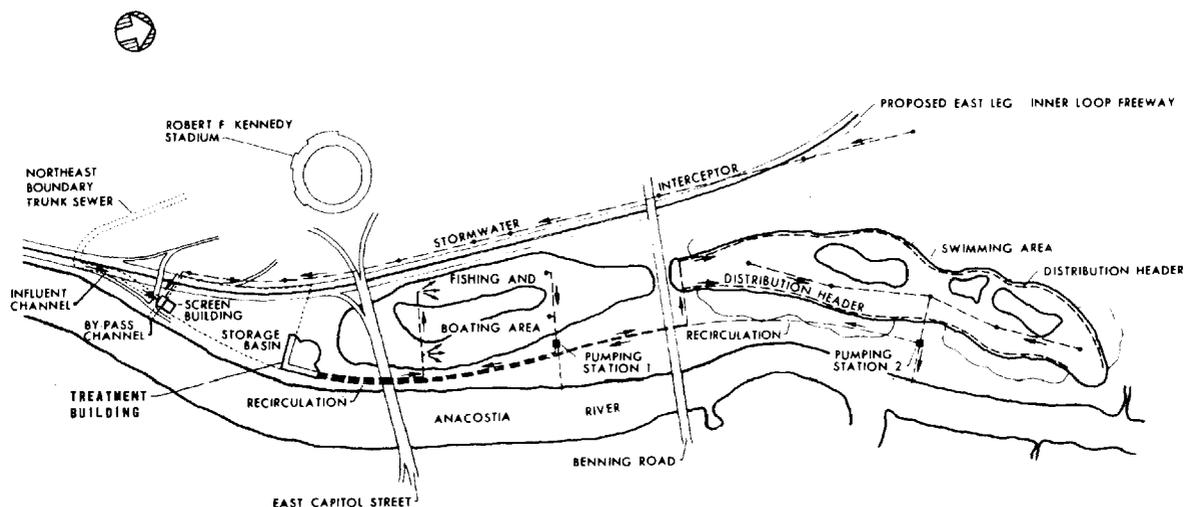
Conceptual plot plan of Kingman Lake water reclamation facility [5]
